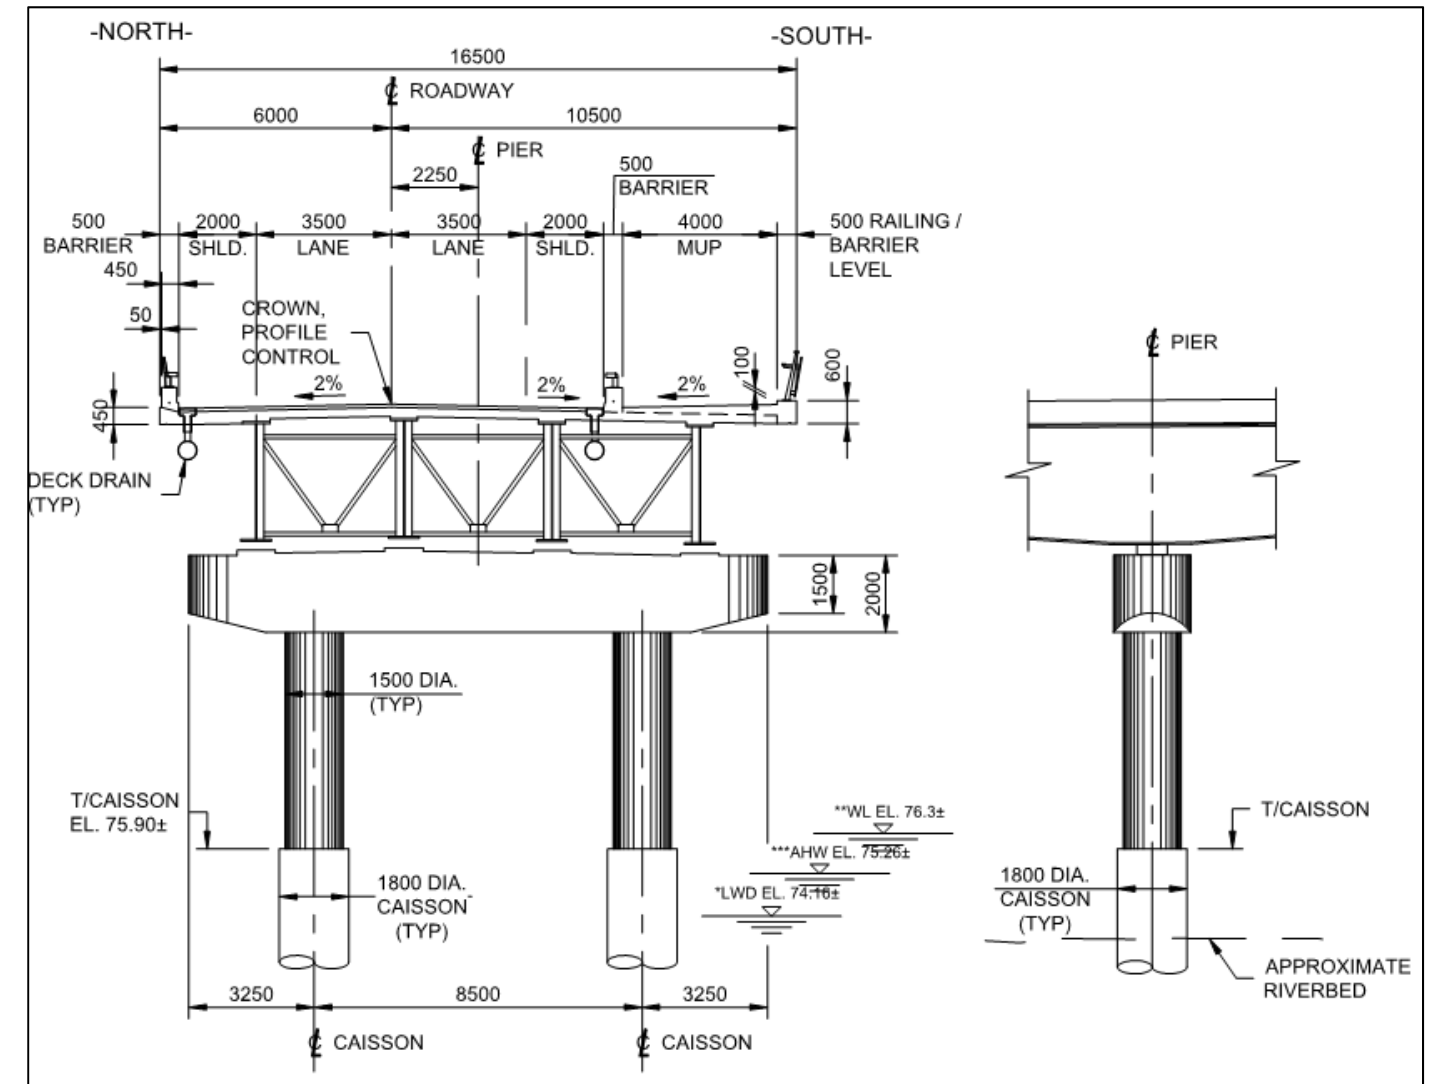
Conventional Circular Piers with Hammerhead Pier Cap
